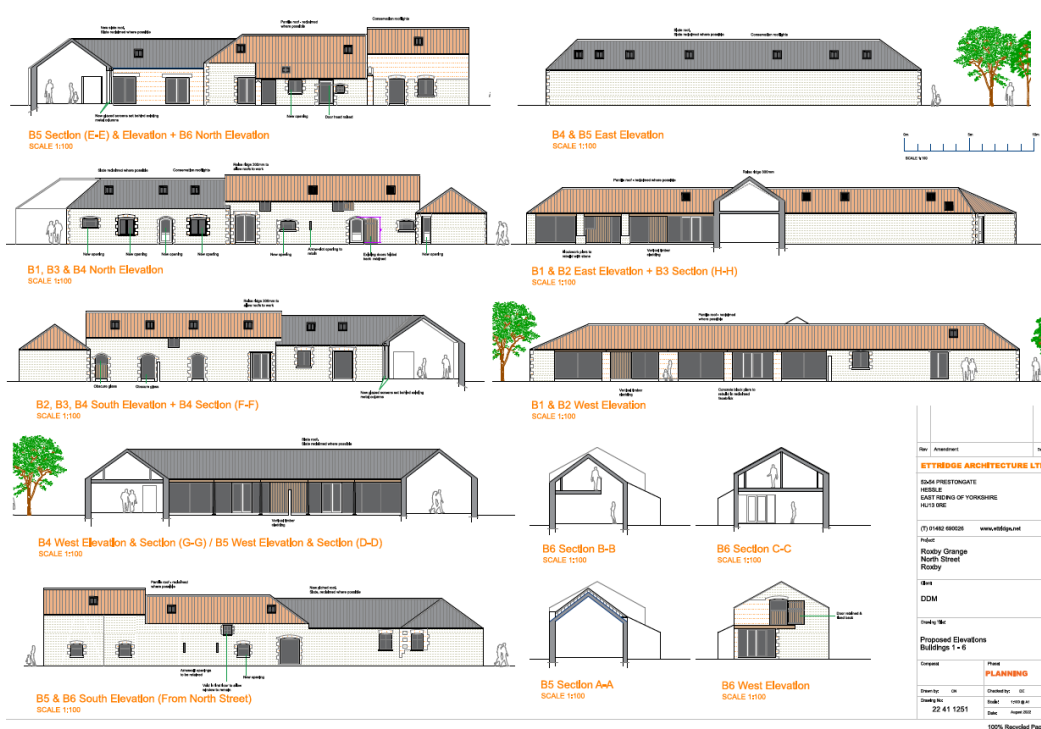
proposed elevations for the conversion and rebuilding of the main yard buildings
